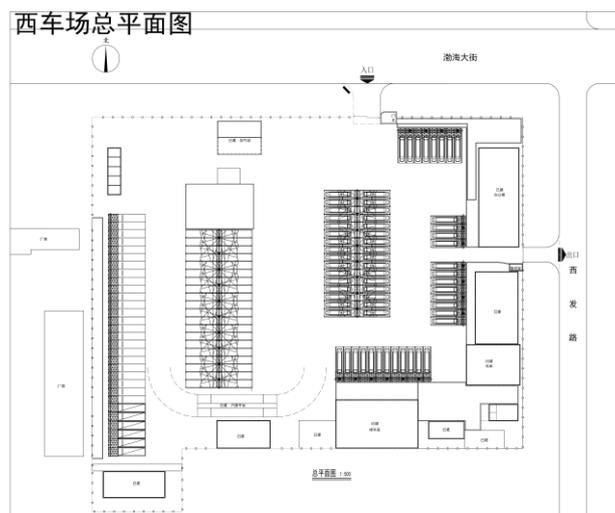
Layout drawing of charging station in Yingkou West Depot
